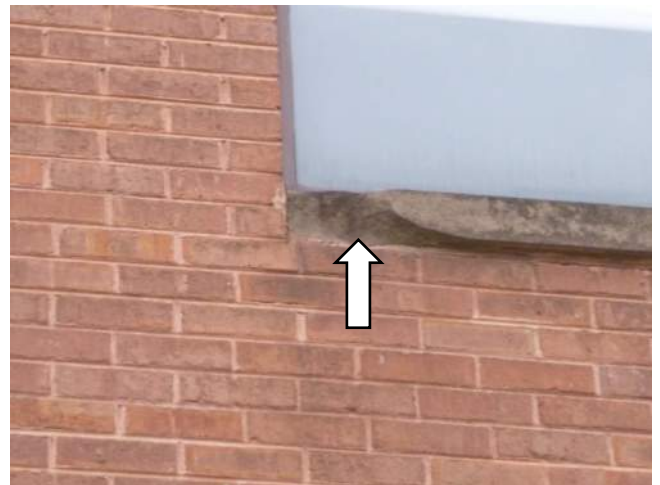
View of staining from embedded steel in the masonry facade on the west elevation.
